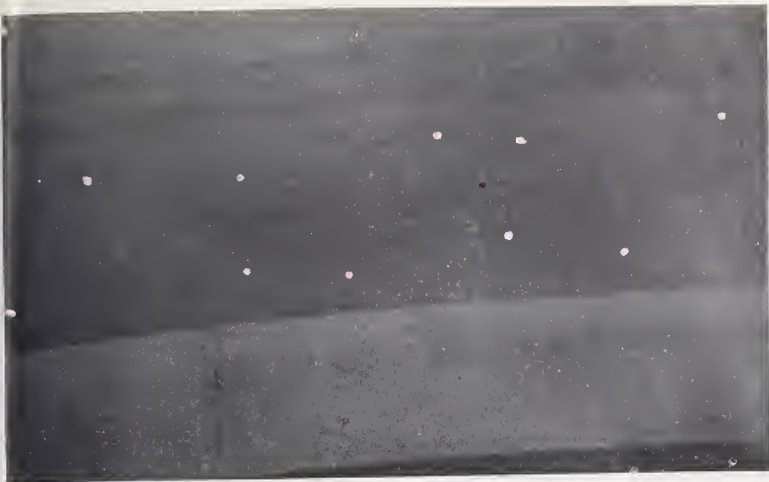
$\frac{1}{8}$ -in. battleship linoleum on wood subfloor (test panel 2-L).
